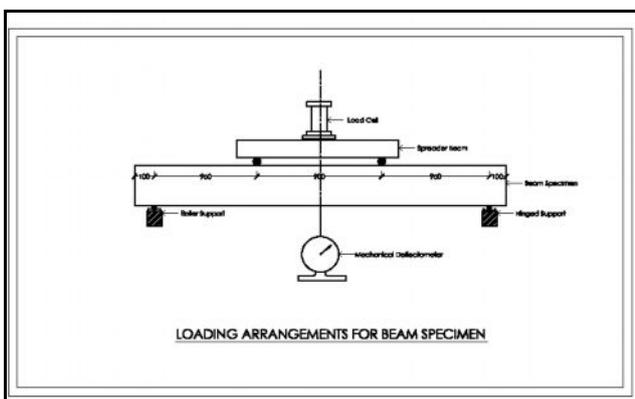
Beam Test Setup Showing Details of Instrumentation
